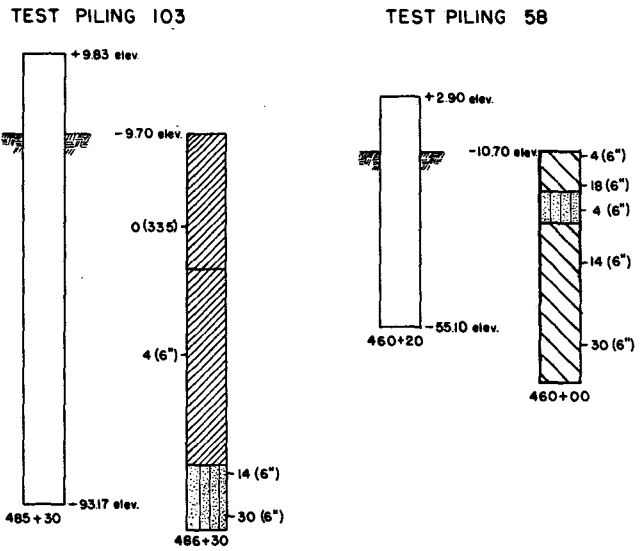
Soil profile for Copano Bay Bridge Load Test Piles 58 and 103.
